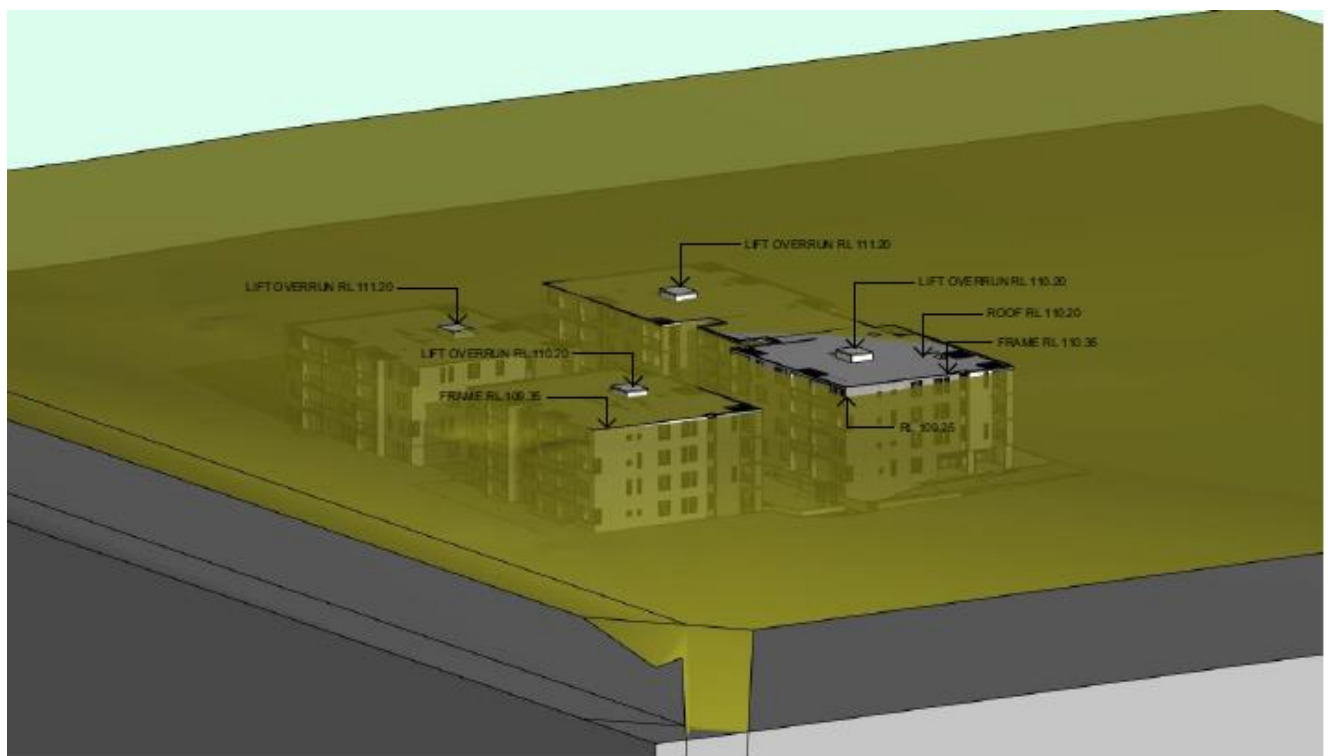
3D Height diagram (Note. Conflicting RI's shown on Building D lift overrun)
